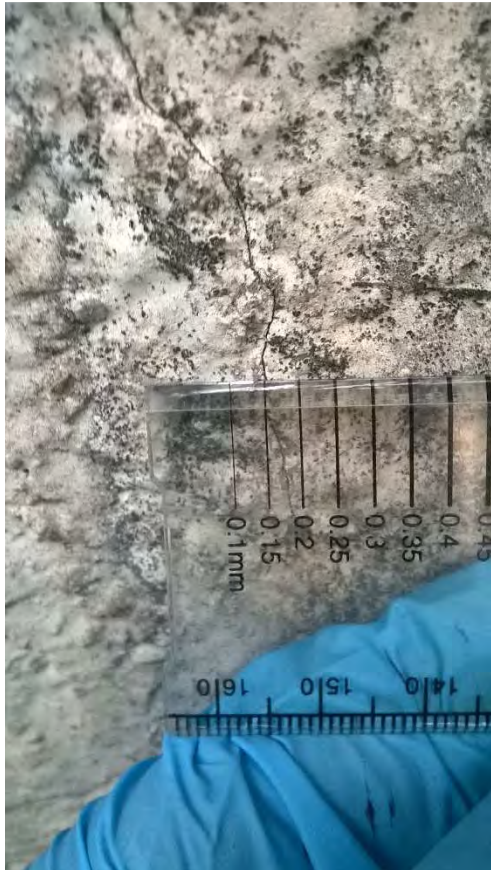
Caustic Tank – Crack through wall (3)
